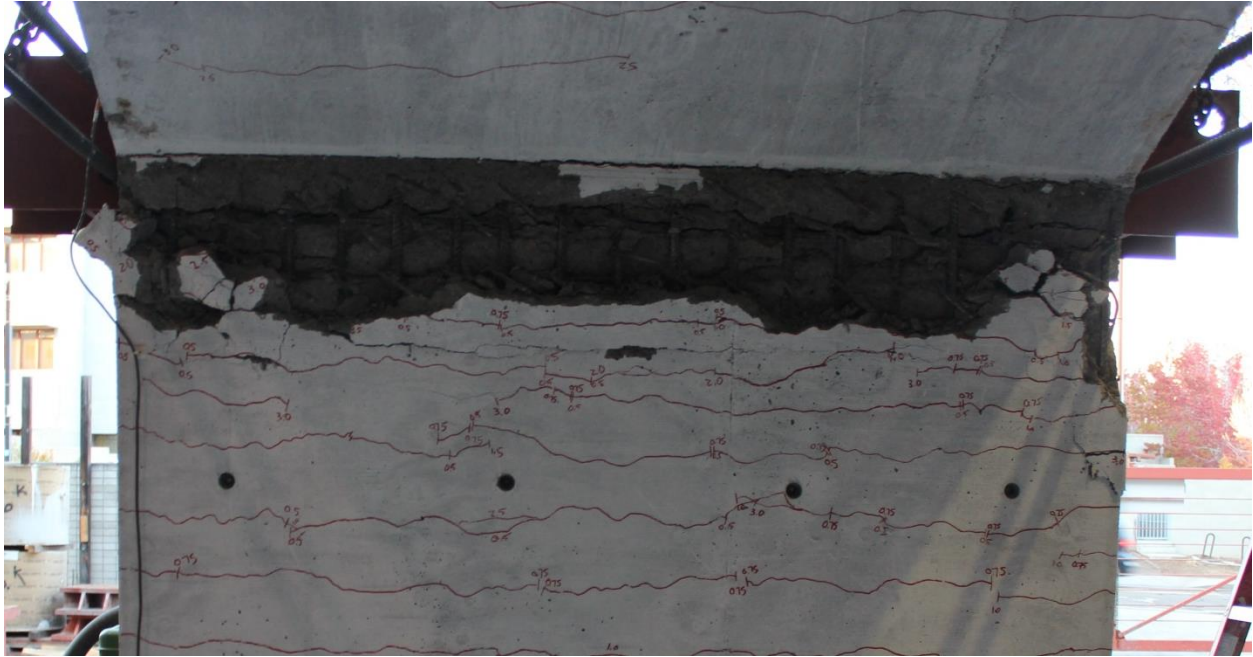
North wall roof interface during negative extension at 8.0% drift ratio (Cycle 27-28). Picture of inside South wall at roof looking South.
